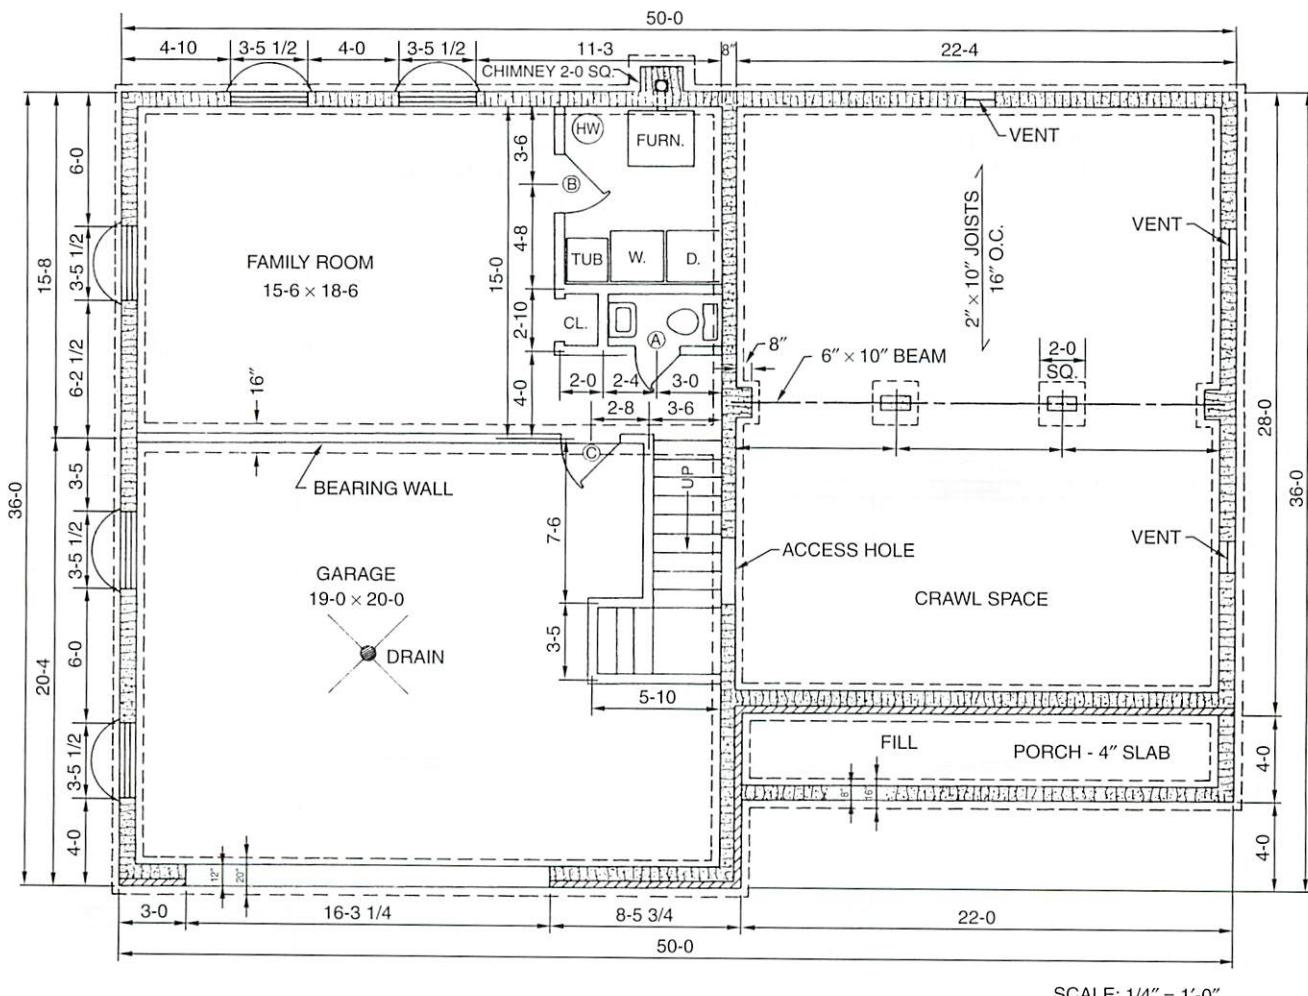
A finished basement/foundation plan for a split-level house. The house is a stud wall structure with some brick veneer.
